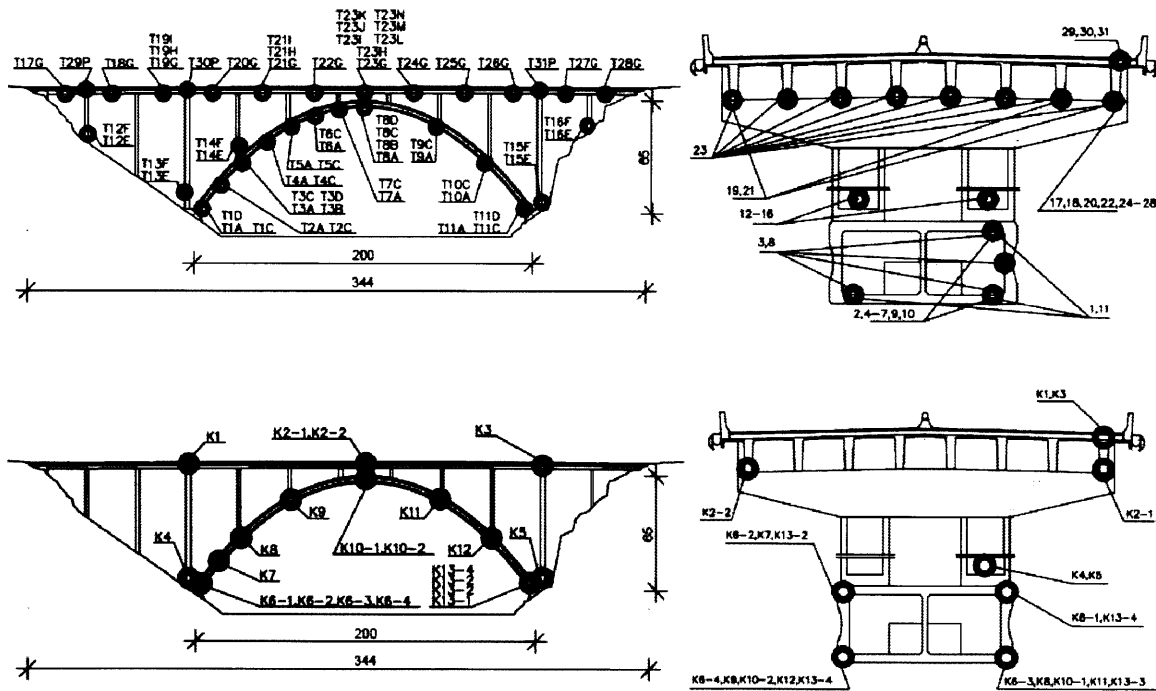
Maslencia Bridge Instrumentation Layout (13)
